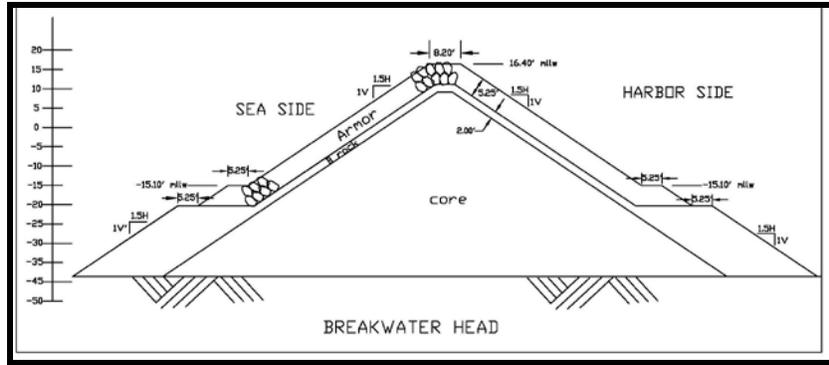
Breakwater cross section of the extension off the South Breakwater towards Japonski Island.
